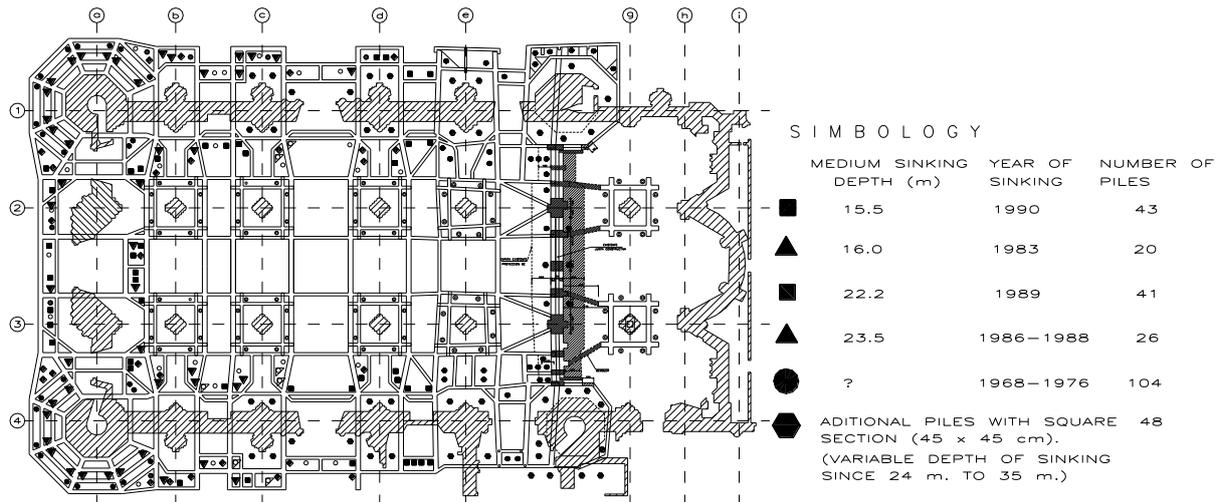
Foundation retrofitting of the Ancient Basilica de Guadalupe with foundation beams and piles of control.
